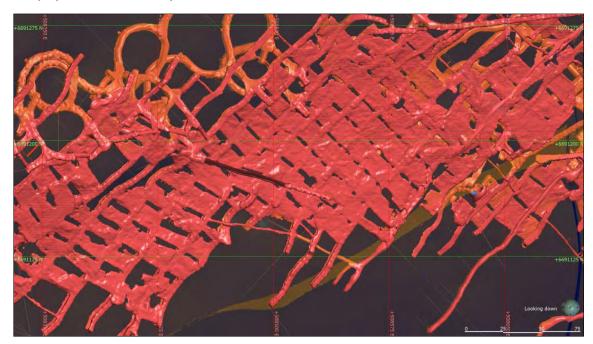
Example of the detail provided by the 3D Underground Lidar survey
